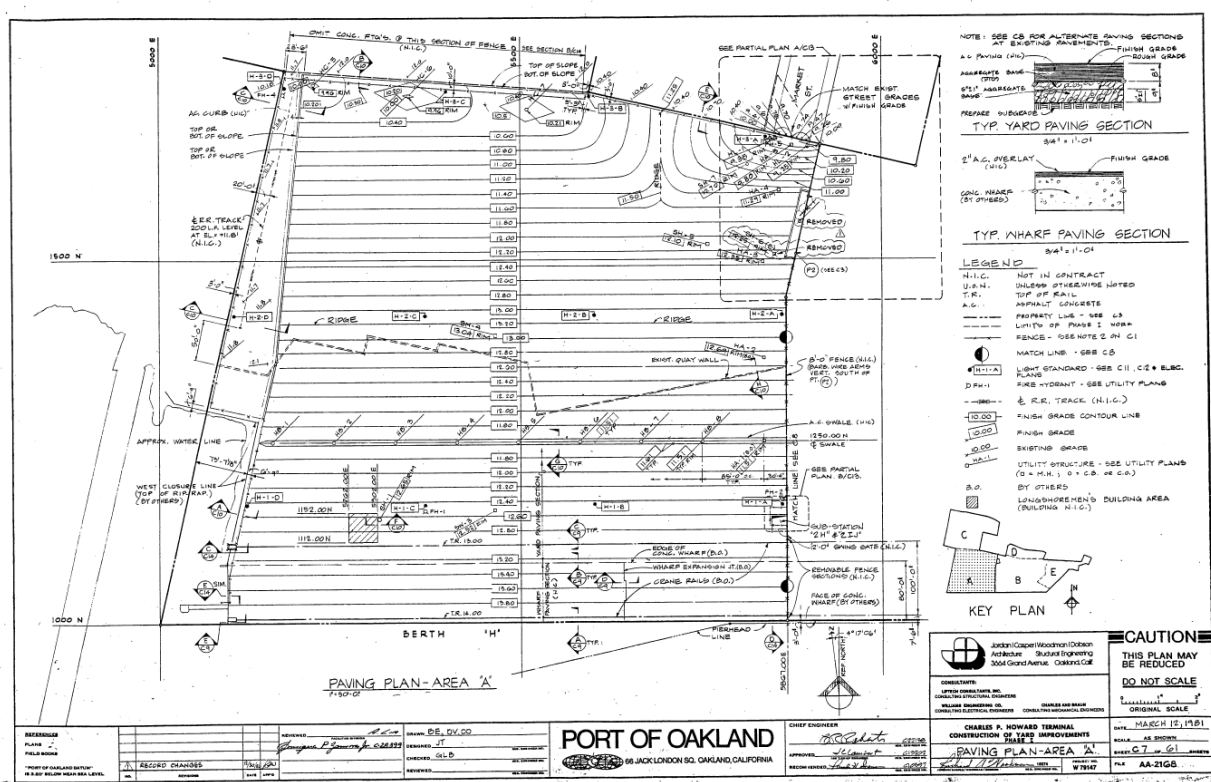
Sheet C-7 of Howard Terminal Yard As-Built Drawings (AA-2168) shows elevations of wharf deck and backlands pavement.
